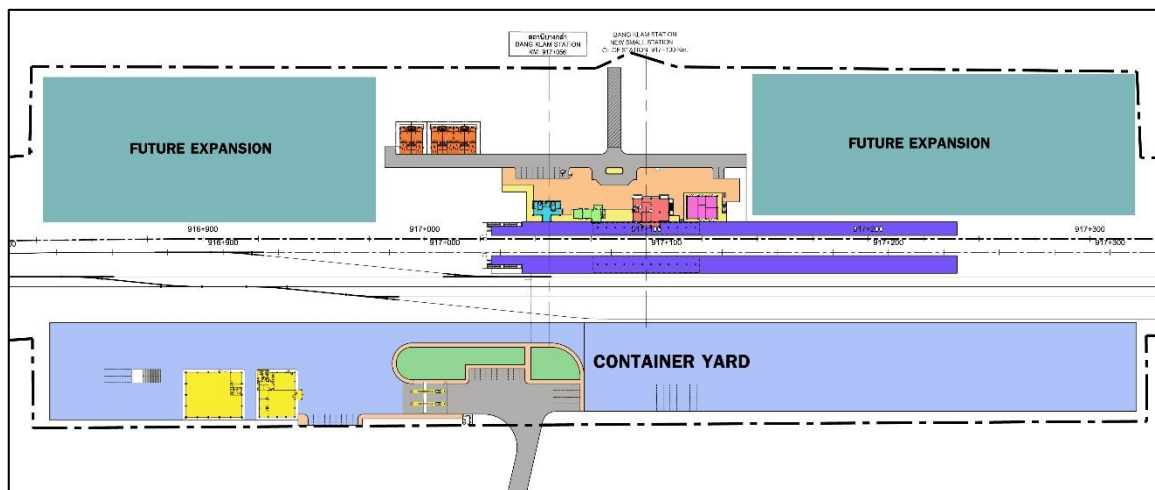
Site Layout Container Yard at Bang Klum Station
